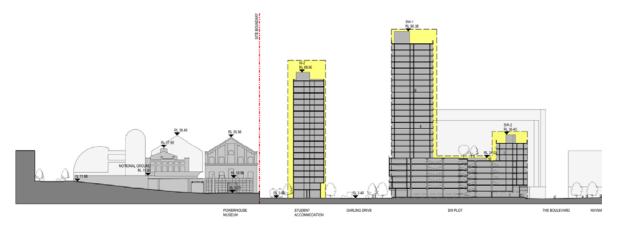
Cross section through Powerhouse Museum and Darling Drive and SW Plots
